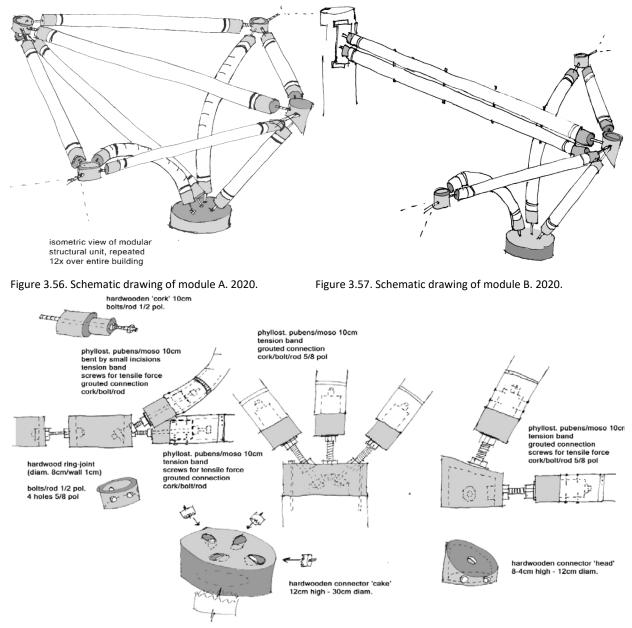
Schematic drawing of the wooden connections used. 2020.
